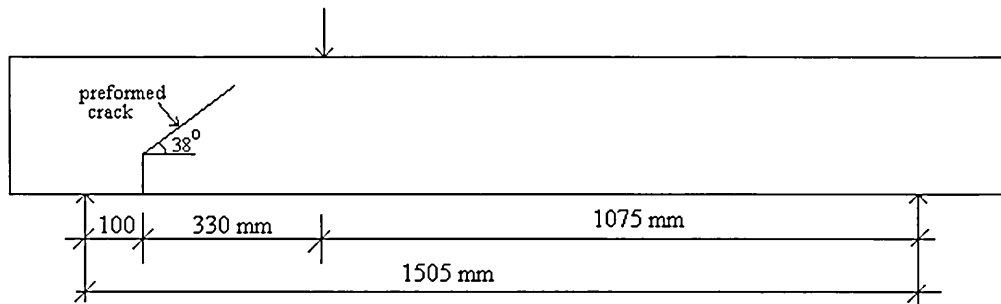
Specimen Details of Group IV Beams-Position of the preformed crack
